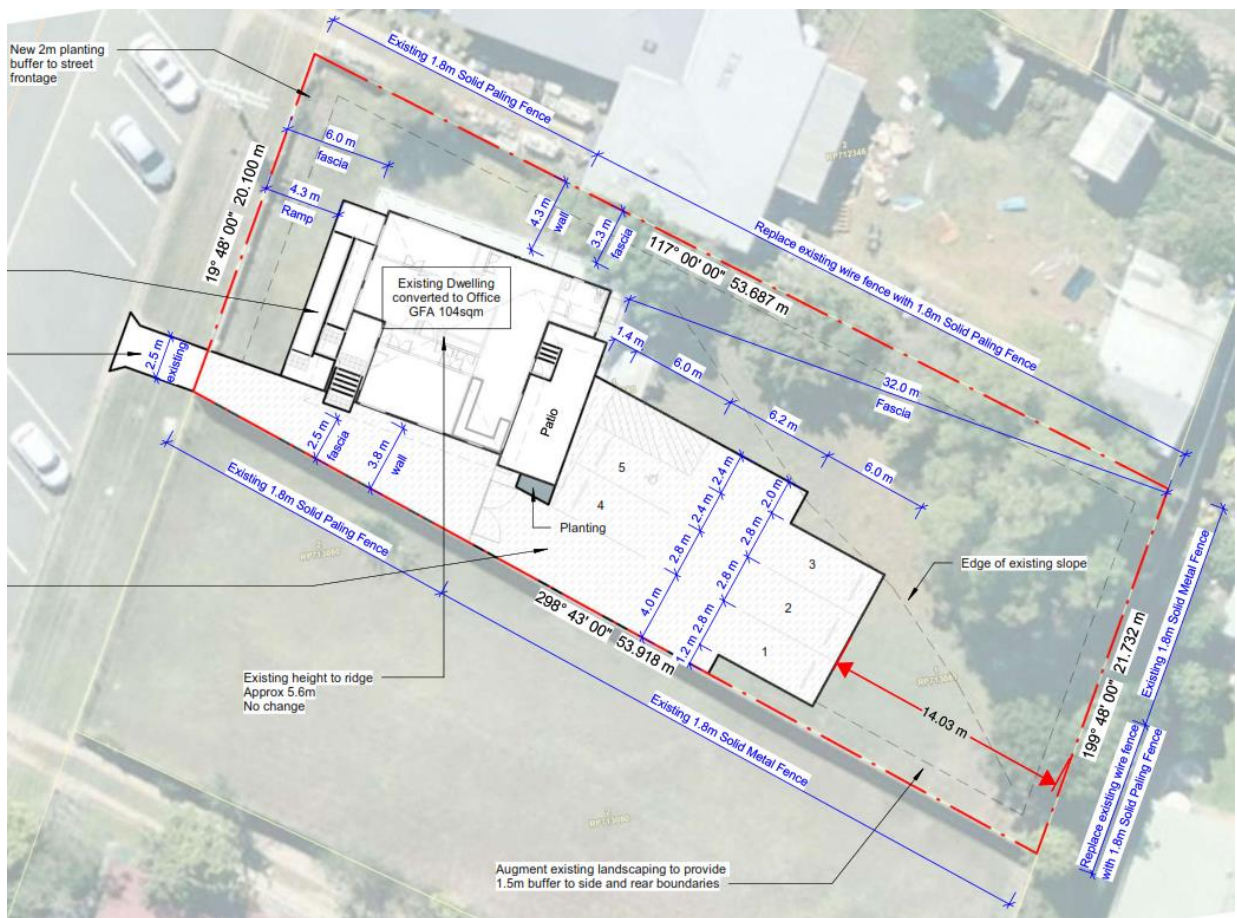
Site Plan (Source: Life Design Consultant, 2026)
